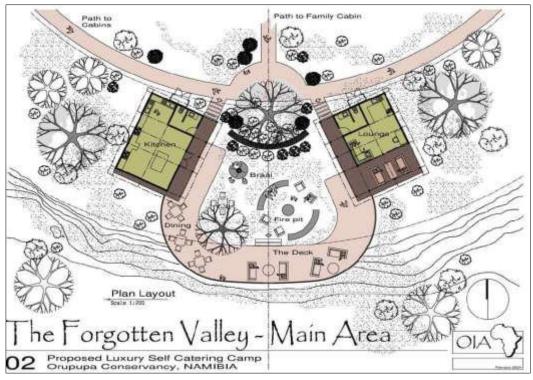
The site layout (sketch) of the proposed infrastructure for the Ekoto Tented Camp (source: Forgotten Valley Camps, 2024)
